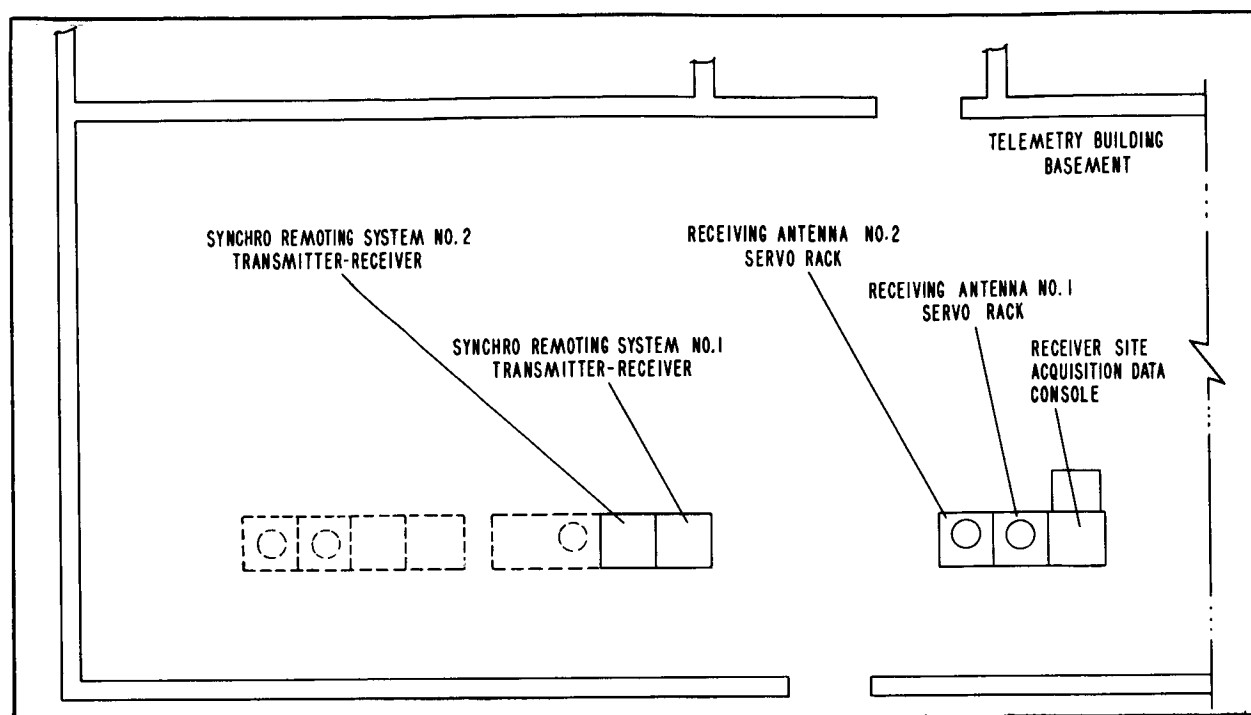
Acquisition System Equipment Layout, Receiver Site Telemetry Building
